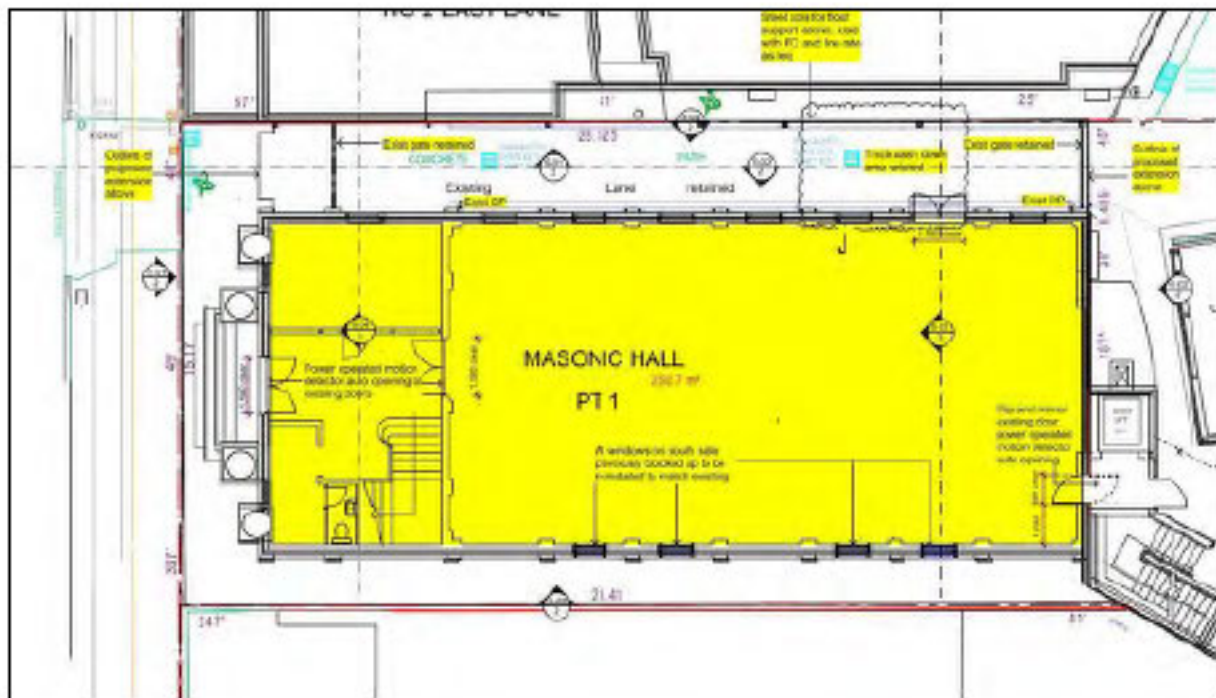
Gross floor area – ground floor (proposed – unchanged from existing)
